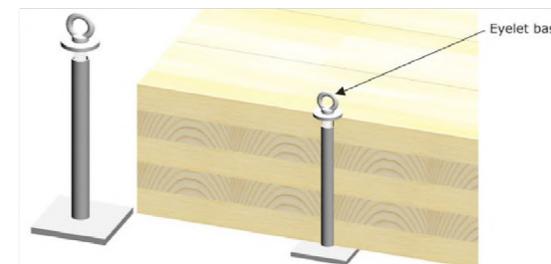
Threaded eyelet bolt (with base) used with socket steel tube welded onto flat steel plate
